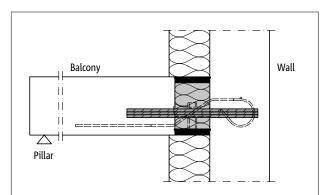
Schöck Isokorb® XT type Q, H-VV-NN: Connection to a reinforced concrete wall with external insulation
